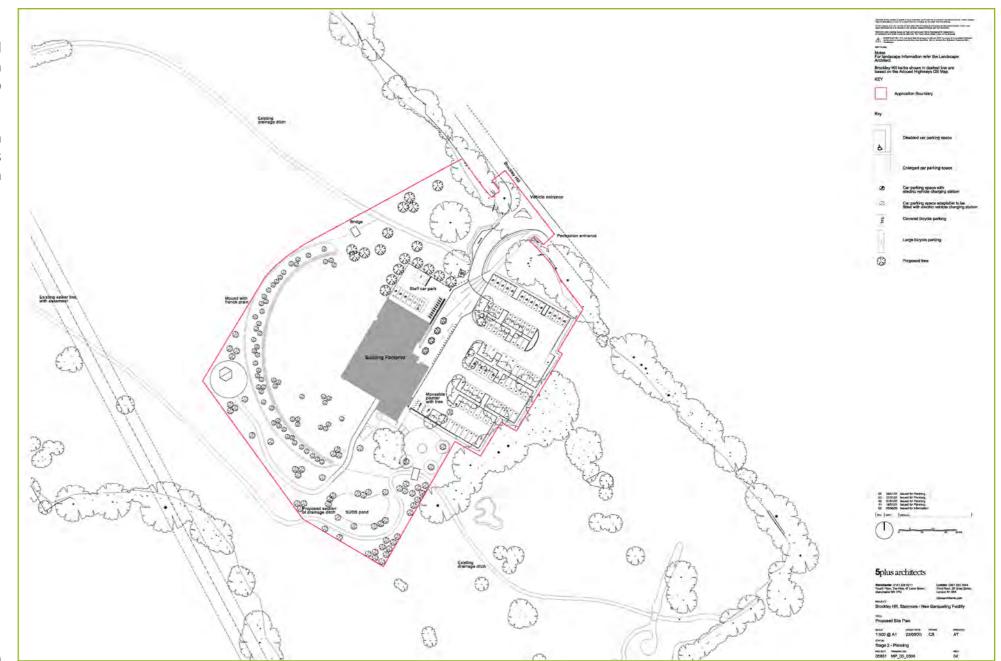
Extract from Proposed Site Plan - 5plus Architects. Drawing Reference MP_0C_0300 Rev 04.
